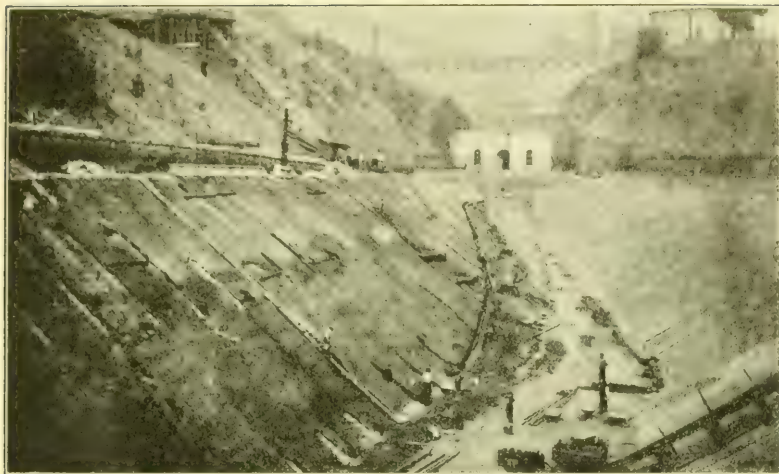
WEST SLOPE, RESERVOIR NO. 4, SHOWING UNDER-DRAINS, SEPTEMBER 21ST, 1904.
